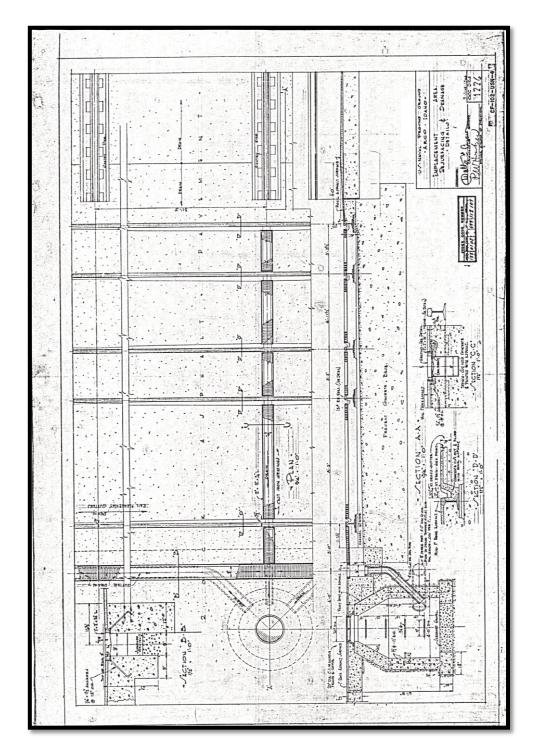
INL drawing number 112107 (CF-102-USN-4); proof / gun emplacement area, details, resurfacing and drainage; June 1944.
